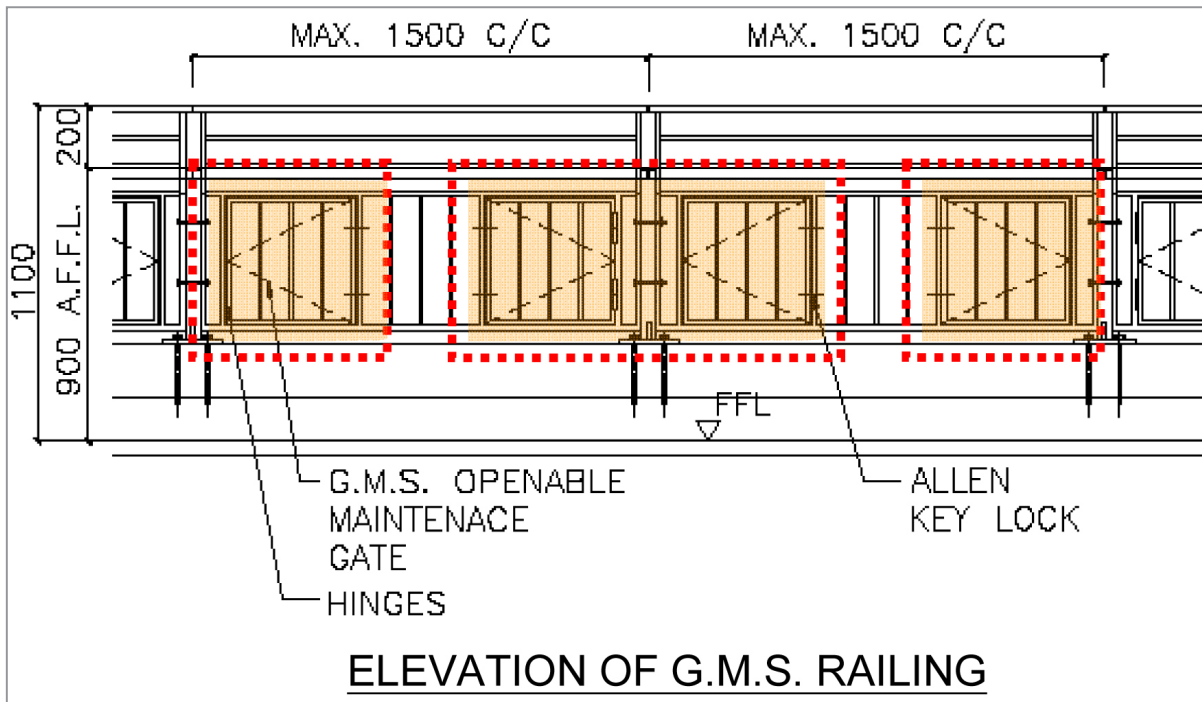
Vertical view of the footbridge showing the elevation of G.M.S. Railing
